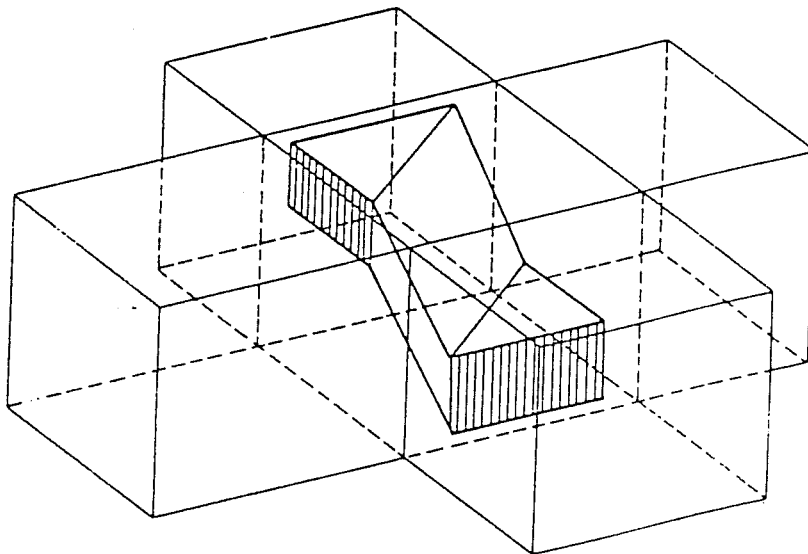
Strut for BCJ12 - Wide beam specimen
